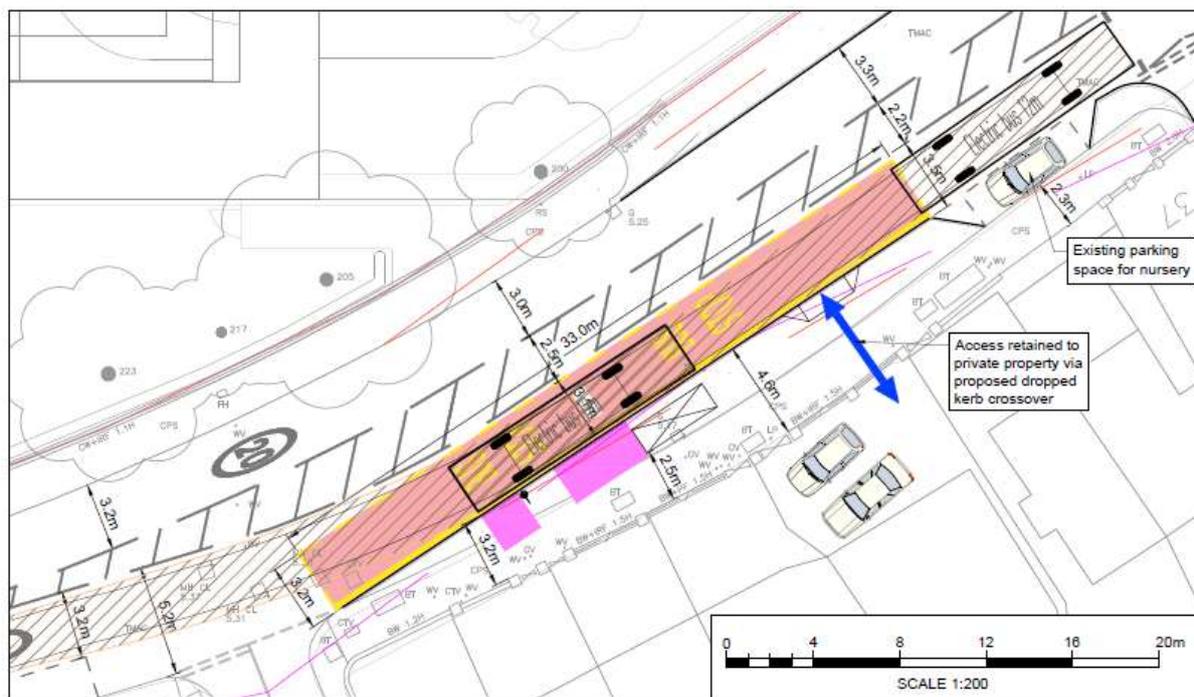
Bus Stop P proposed location showing driveway at No. 43
